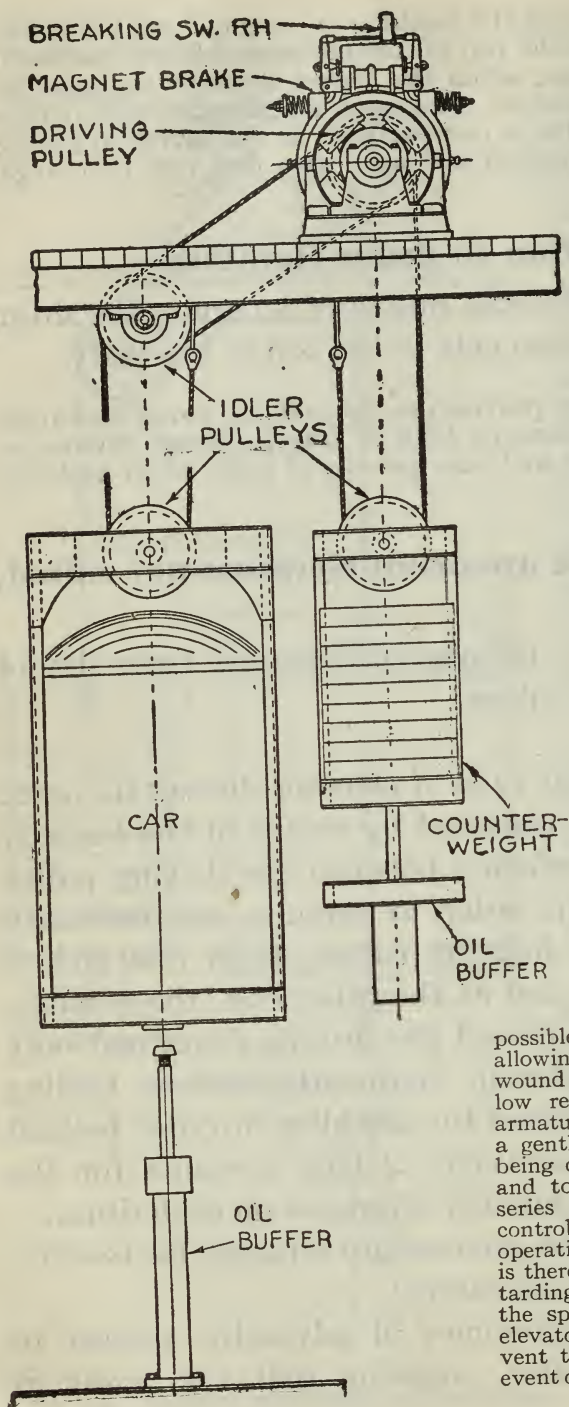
,115.—Diagram of Otis, over-mounted 2 to 1 traction elevator. This machine is similar in appearance to the standard drum machine, except that a multi-grooved driving pulley is mounted in place of the drum, and a non-vibrating idler leading pulley takes the place of the vibrating pulley necessary on the drum type. The car and the counter-balance weight hang directly from the driving pulley, one from either end of the cables in precisely the same manner as with the 1 to 1 drive, the necessary amount of traction being obtained by the extra turn of the cables resulting from passing around the idler pulley. The machine is equipped with a mechanically applied and electrically released double shoe brake. The shoes are applied against a pulley of ample diameter and width to dissipate any heat generated, which also serves as a coupling between the motor shaft and the worm shaft. The brake shoes, normally, are bearing against the pulley with a pressure corresponding to the compression of the two helical springs. When current is admitted to the solenoid brake magnet, and then only, the action of the springs for the time is overcome, so that the shoes are released. It will be seen, therefore, that the brake will apply with full force should a failure of current occur, resulting in an immediate stop of the elevator. The motor is compound wound and runs usually at about eight hundred revolutions per minute at full car speed and load. The series field is used only at starting to obtain a highly saturated field in the shortest possible time, and this is then short circuited, allowing the motor to run as a plain shunt wound type. In stopping, a comparatively low resistance field is thrown across the armature, providing a dynamic brake action and a gentle slowing down of the car, the brake being called upon only to effect the final stop and to hold the load at rest. Resistance in series with this *extra field* as it is called, is controlled by magnets which depend in their operation on the speed of the armature. It is therefore evident that the dynamic or retarding effect of the field is proportional to the speed; and therefore to the load in the elevator. Rope guards are provided to prevent the cables leaving their grooves in the event of either car or counterweight bottoming.
